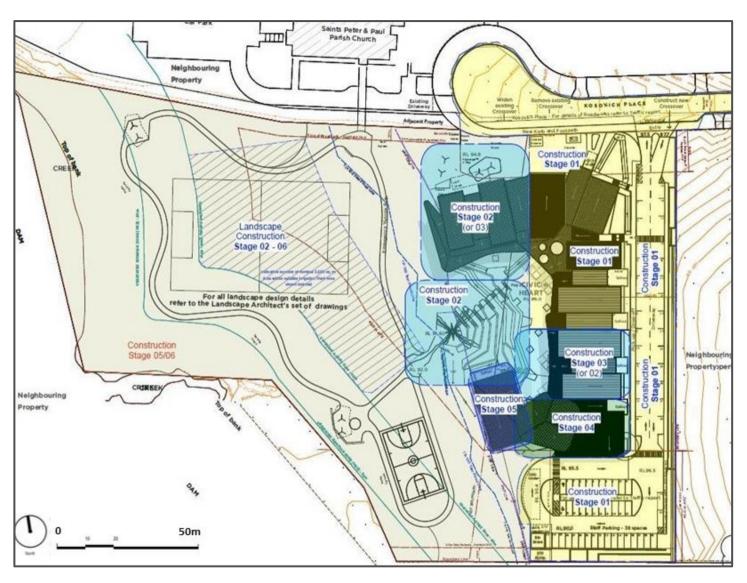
| Site construction staging plan (Source: Applicant's EIS 2018)
